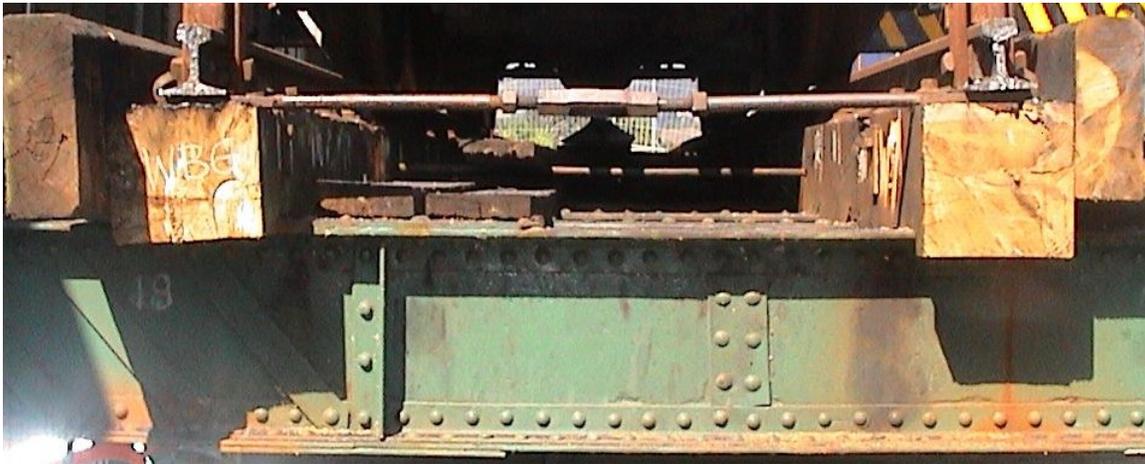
View of secondary deck at transverse girder 18, with way-beam 6 at left
